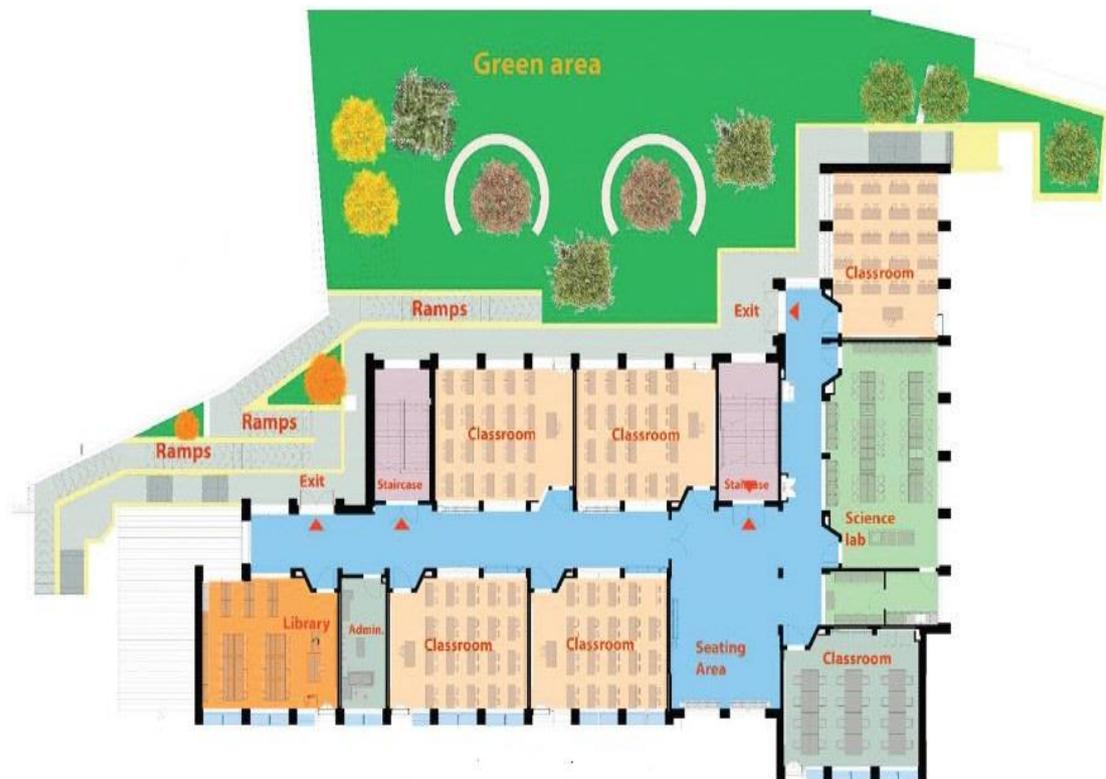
The Plan of the First Floor of Aqqaba Green School
